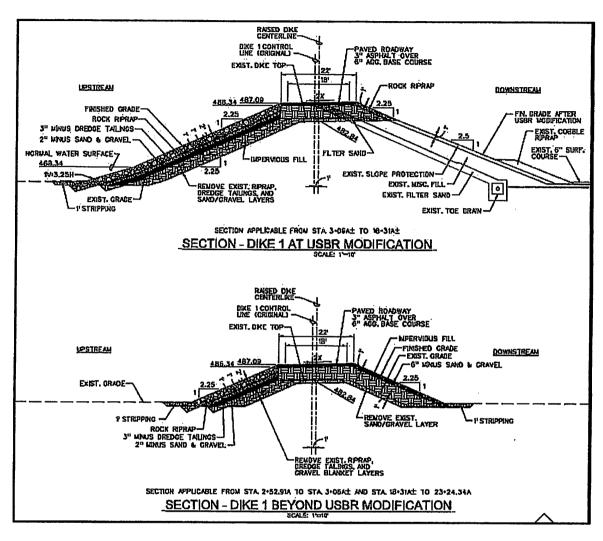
Preliminary typical cross section for 3.5-foot raise at Dike 1.
